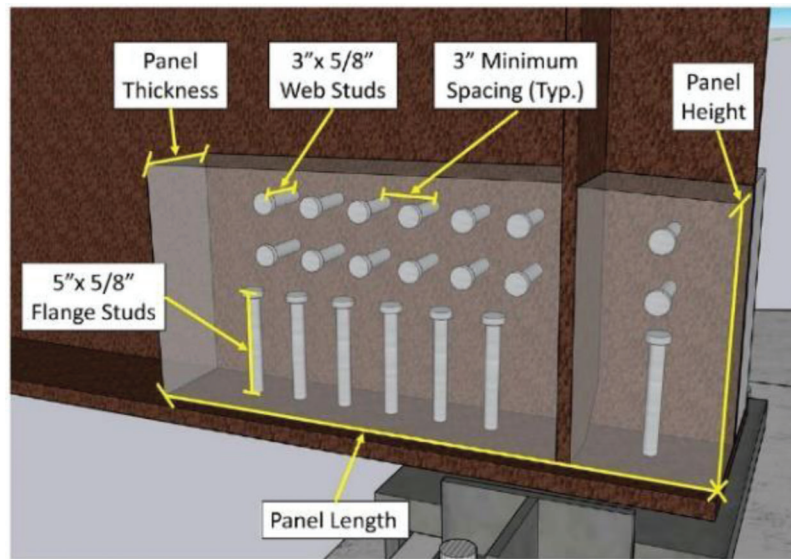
Stud sizing and layout and UHPC panel size (Lassy et al., 2023).
